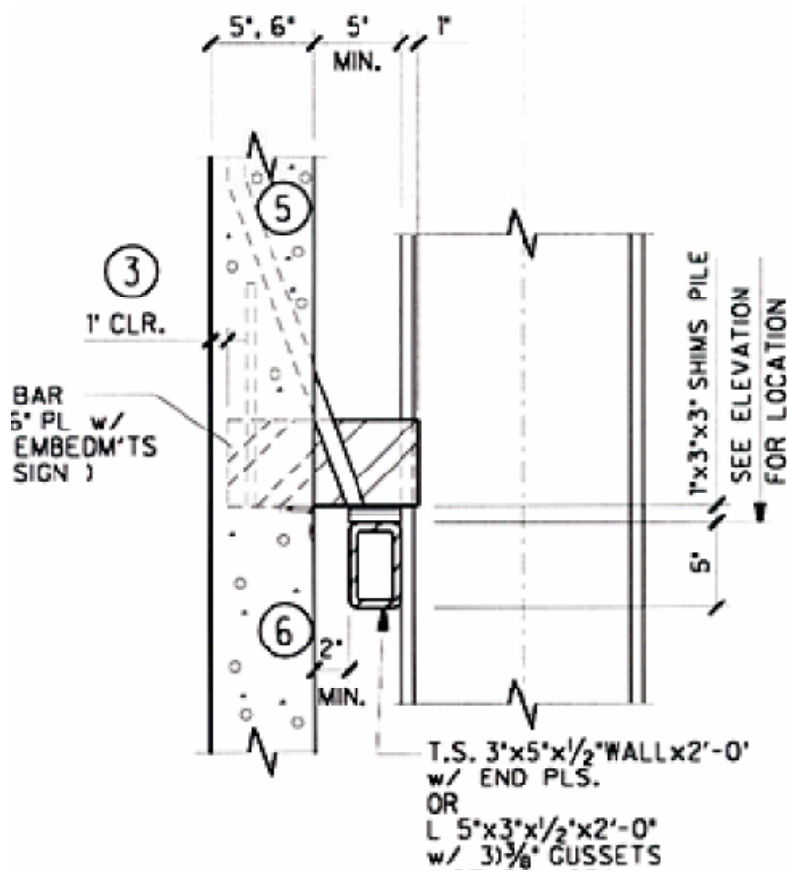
TYPICAL PANEL TO COLUMN CONNECTION DETAIL (COURTESY OF HIGHCONCRETE.COM)
